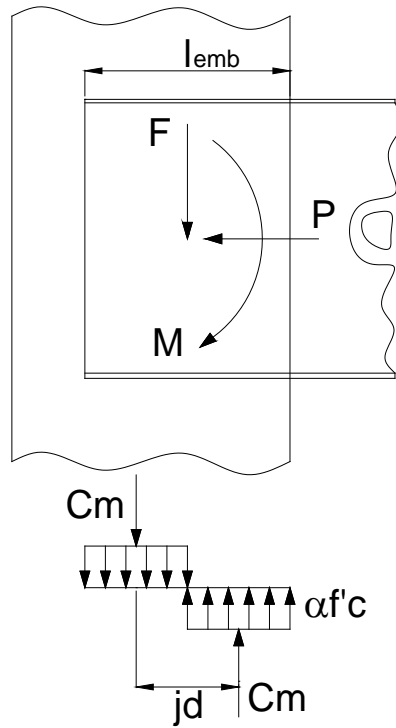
Elevation of girder-abutment connection showing the simplified mechanism used for calculating the embedment length
